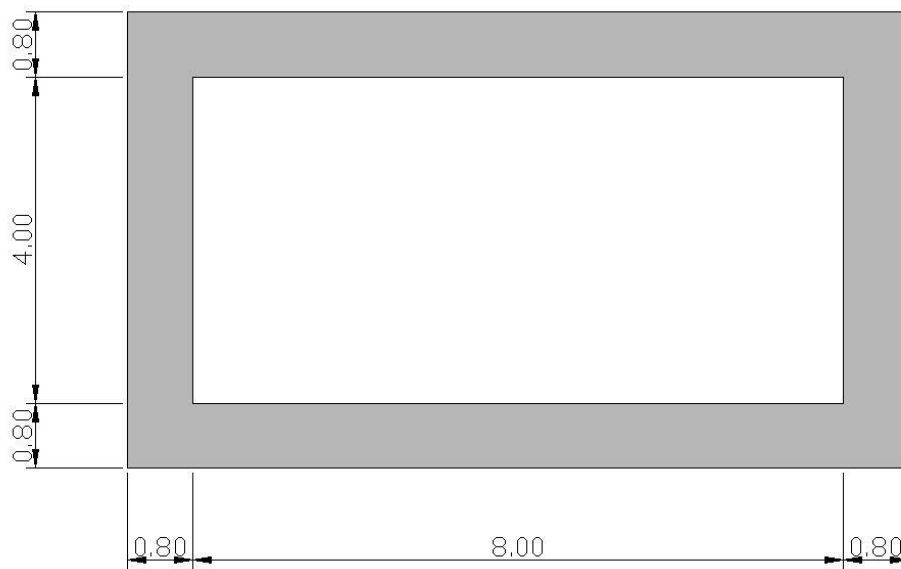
Cross-sectional structure geometry and member dimensions of Structure 2
